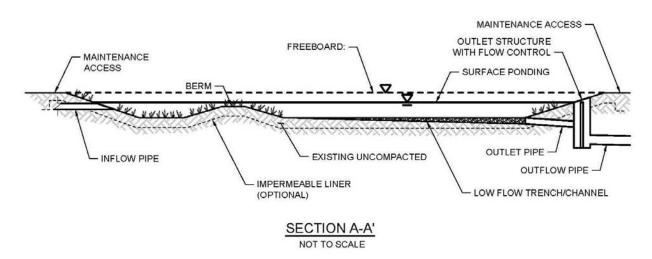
Typical plan and Section view of a Dry Extended Detention Basin BMP
